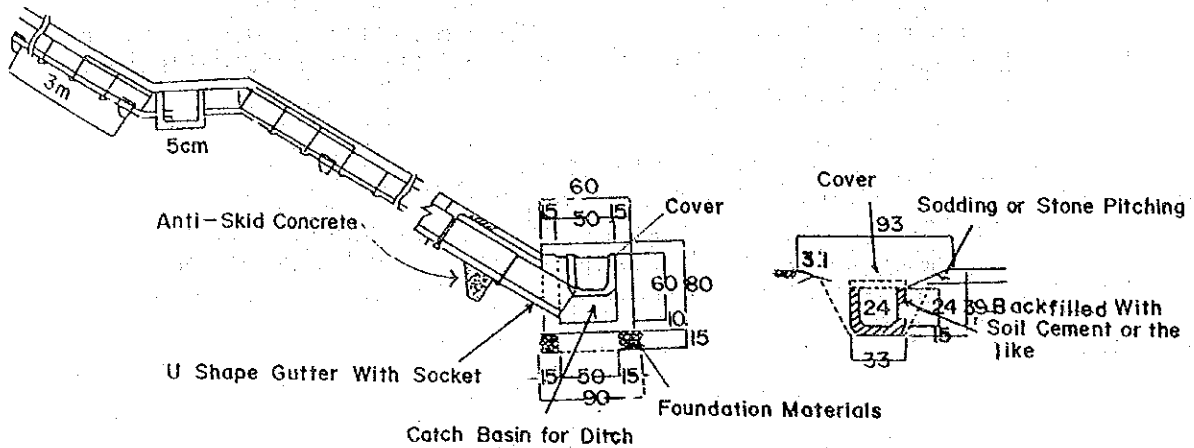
REINFORCED CONCRETE U-SHAPED GUTTER
